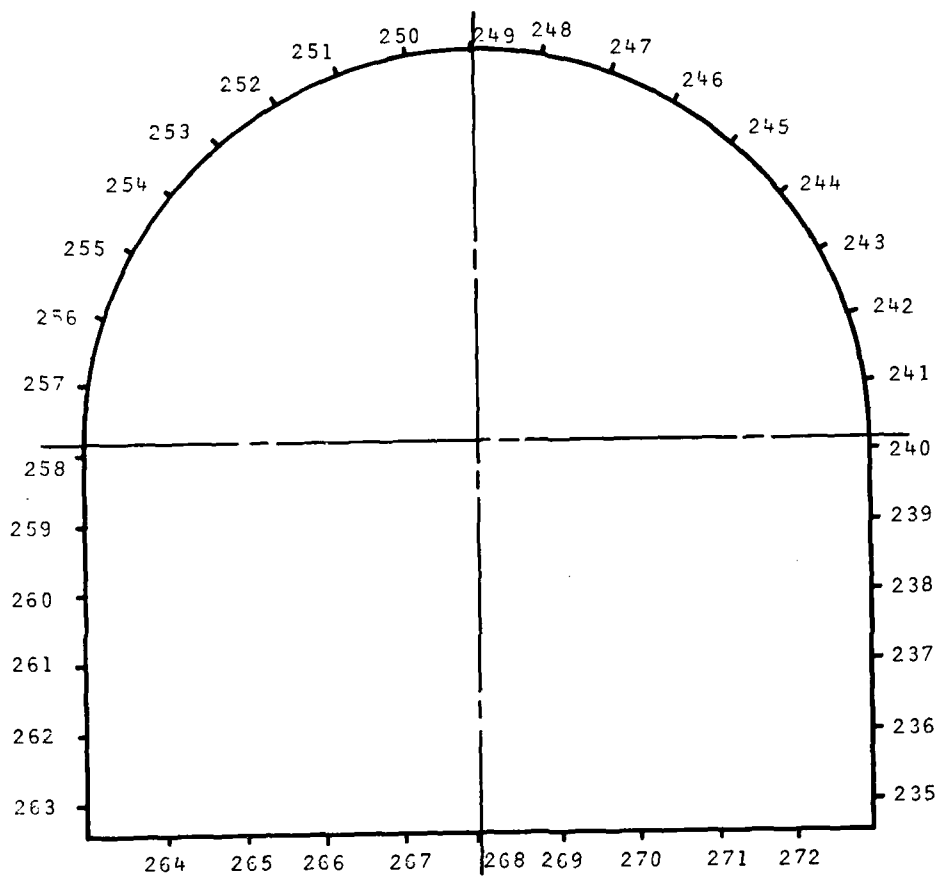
Passive gage point identification at Construction Station 6+53.
